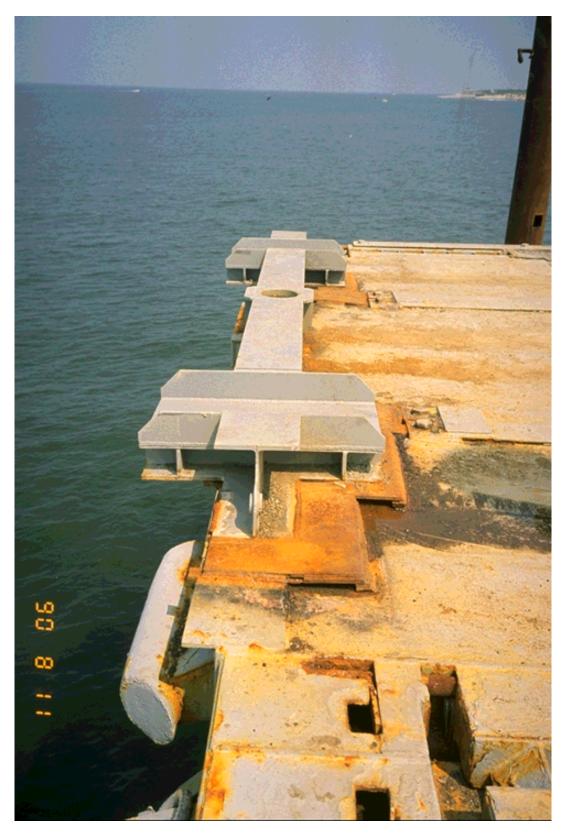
LMMSA/ELCAS Foundation Beam on ELCAS (NCEL Photo 2428-90)
